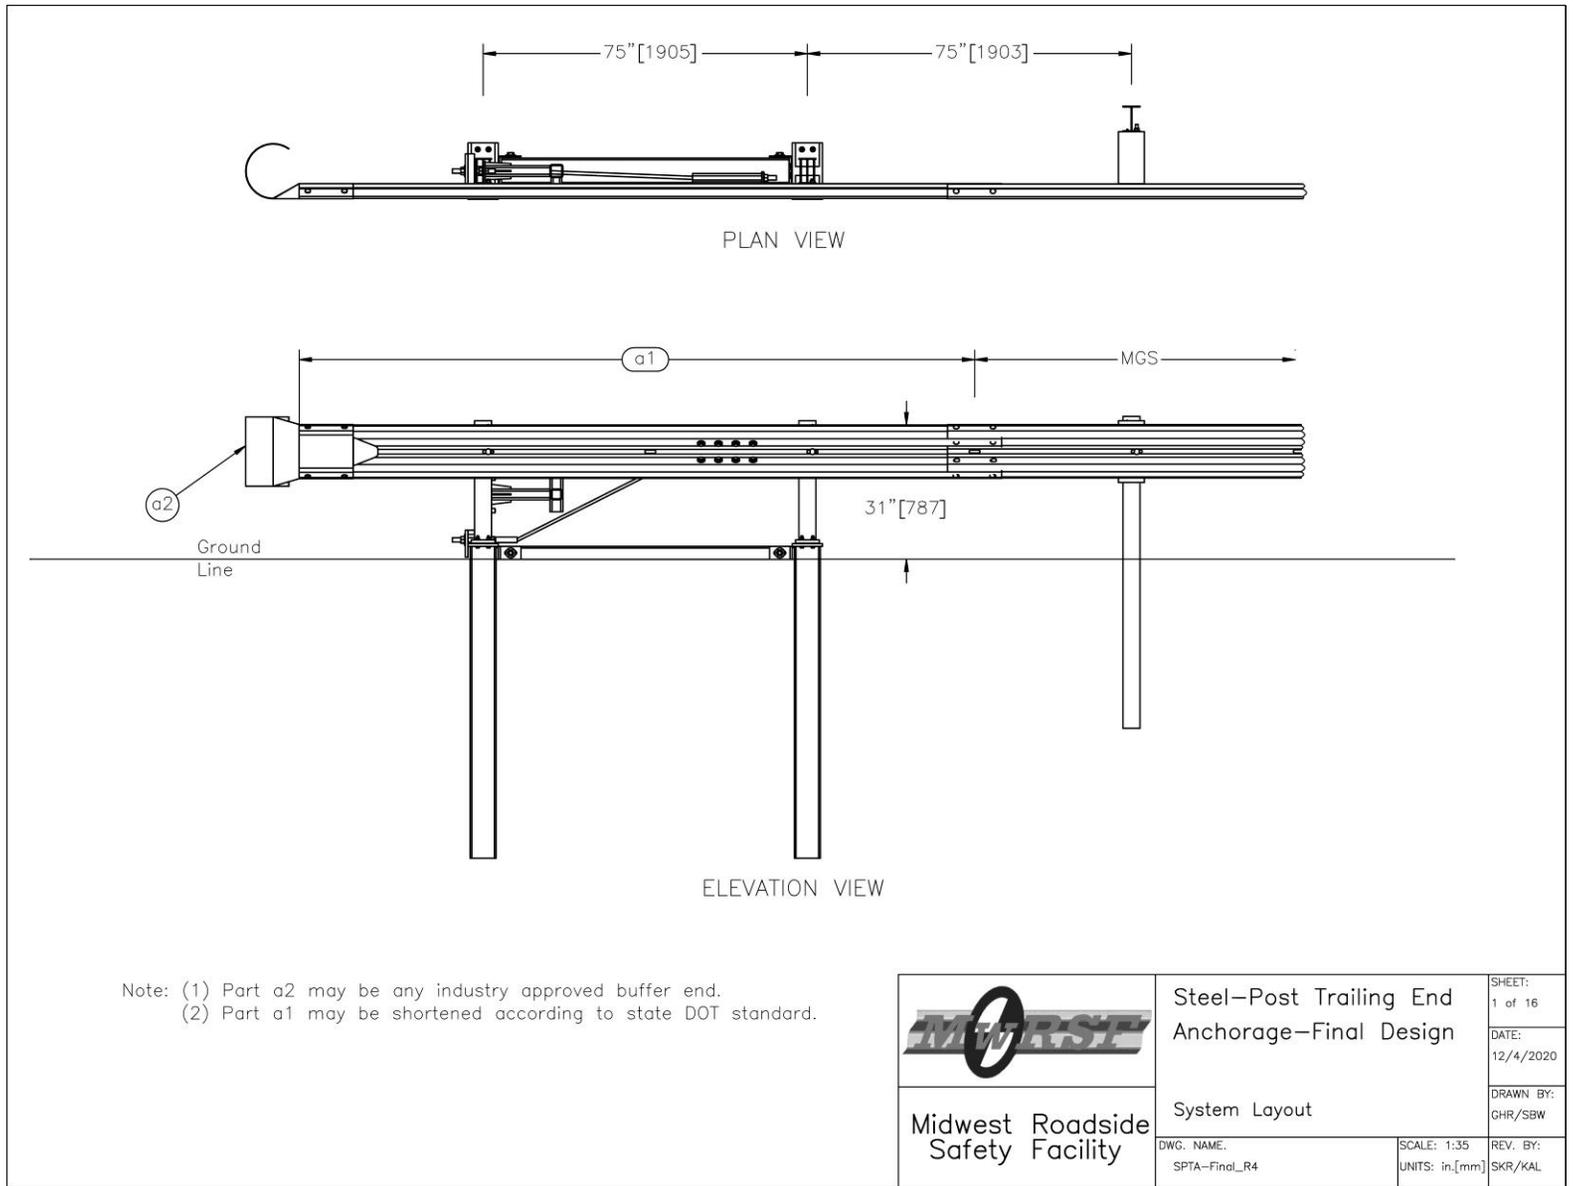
Steel-Post Trailing End Anchorage, System Layout
